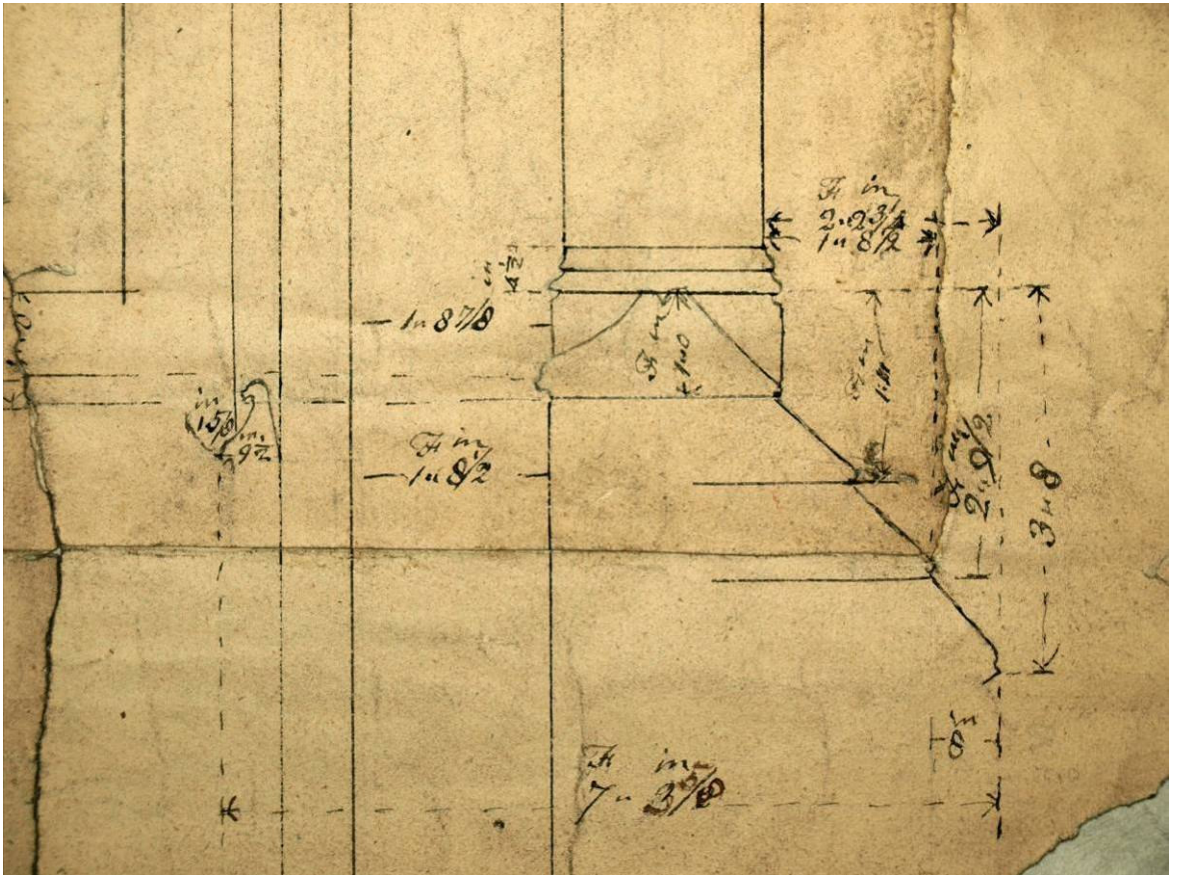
Detail of section through Great East Window sill, William Shout c.1825 (YML/31/290)
